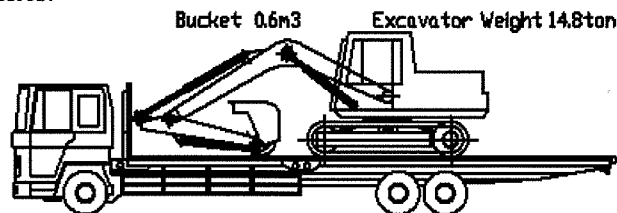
Construction Equipment Transportation Plan (using 15-ton truck)
